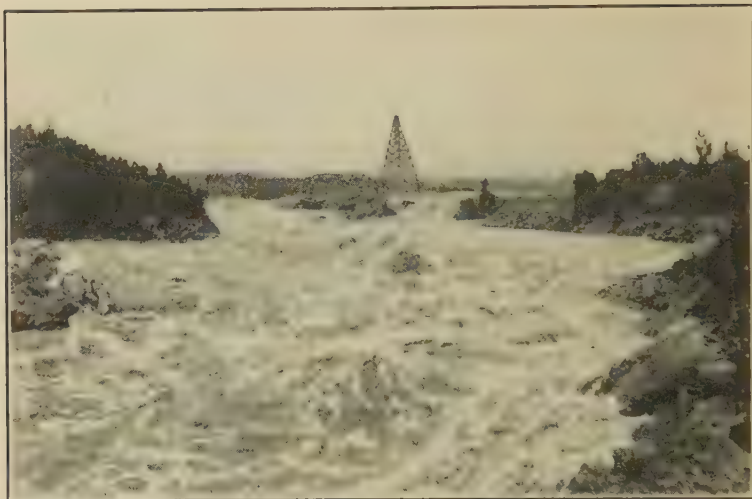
ST. LOUIS RIVER LOOKING UPSTREAM TOWARDS THOMSON DAM SITES, SHOWING ONE OF THE CABLEWAY TOWERS.
